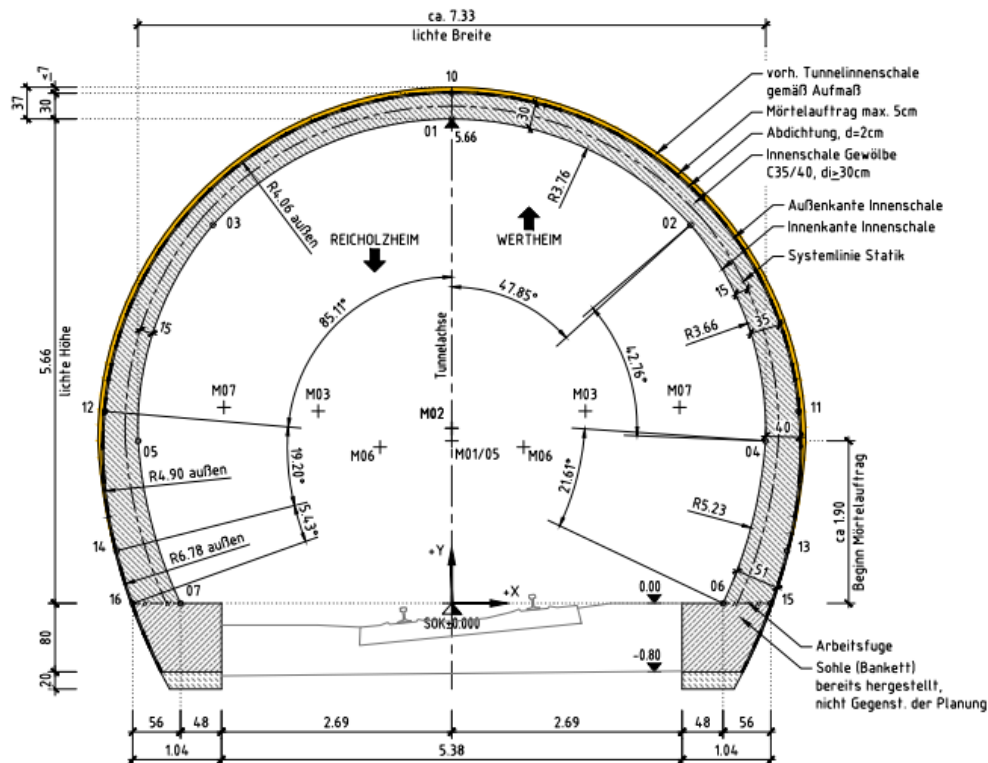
Cross section of the inner shell tapering towards the tunnel roof [source: müller + hereth GmbH].
